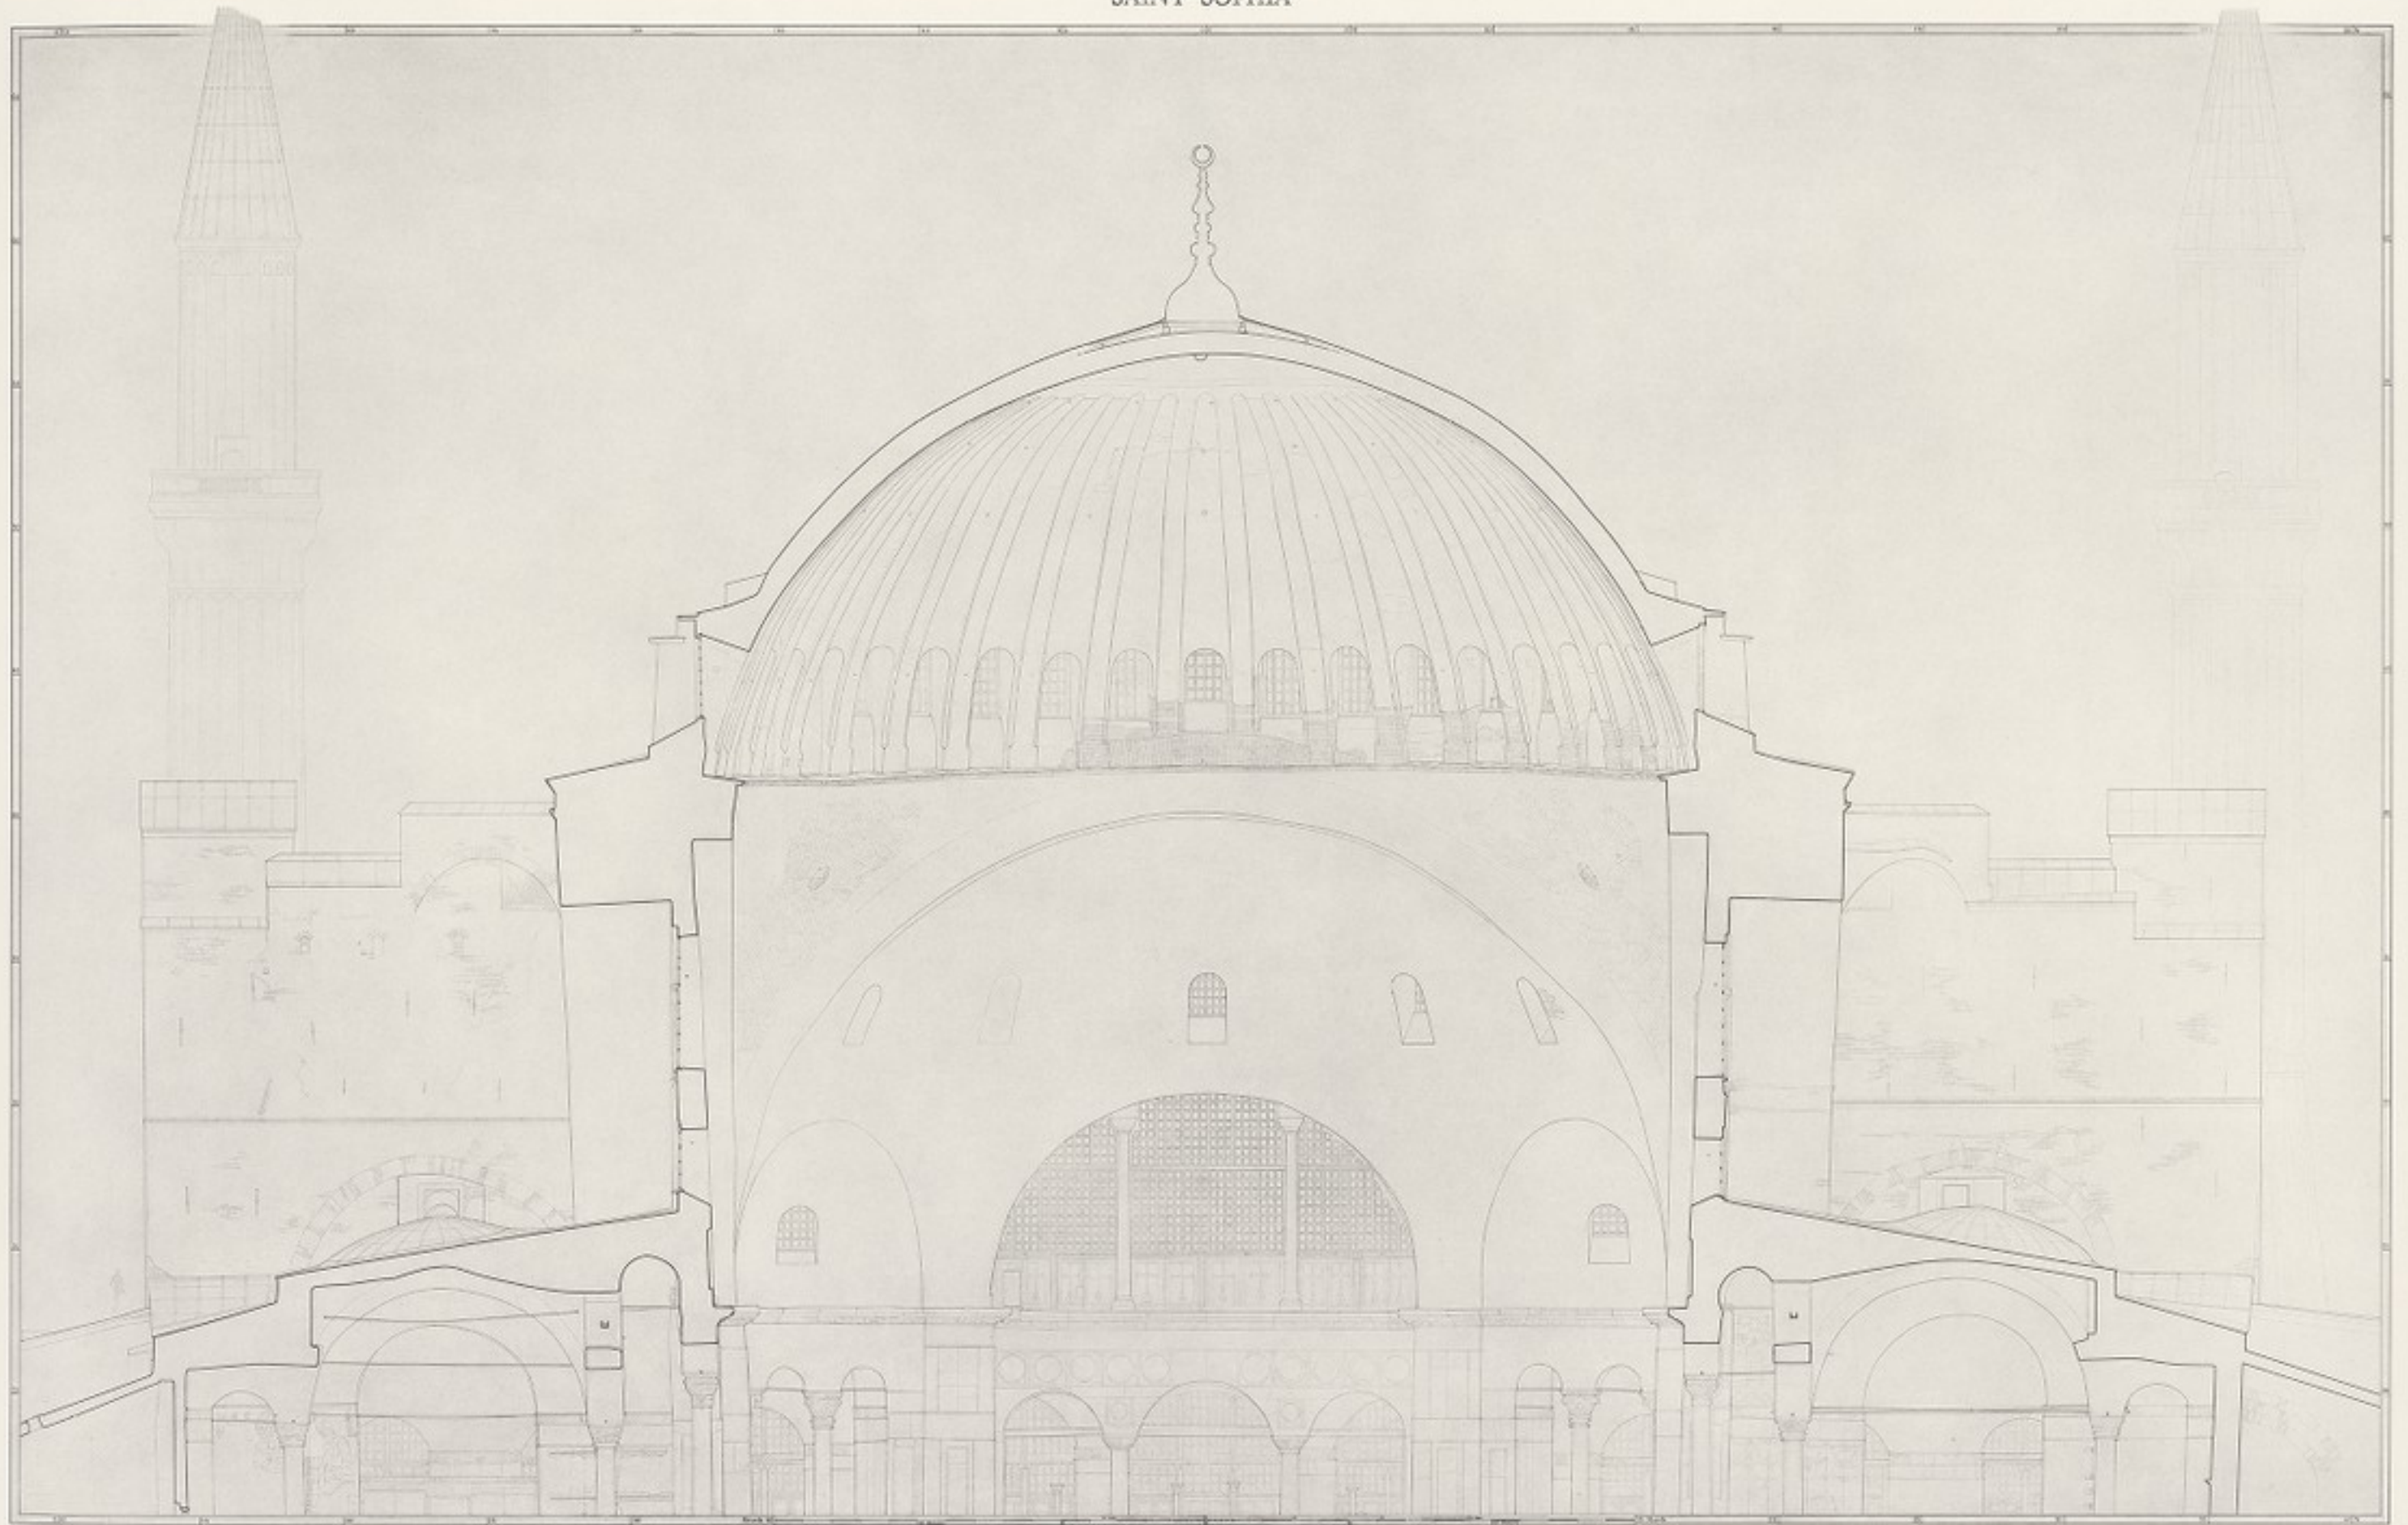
TRANSVERSE SECTION, LOOKING WEST
